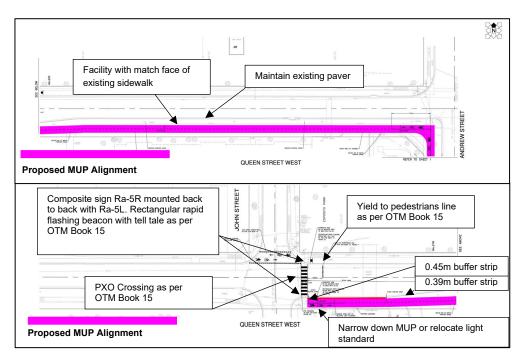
Section of the proposed route alignment's roll plan, along Queen St W between Andrew St and John St
